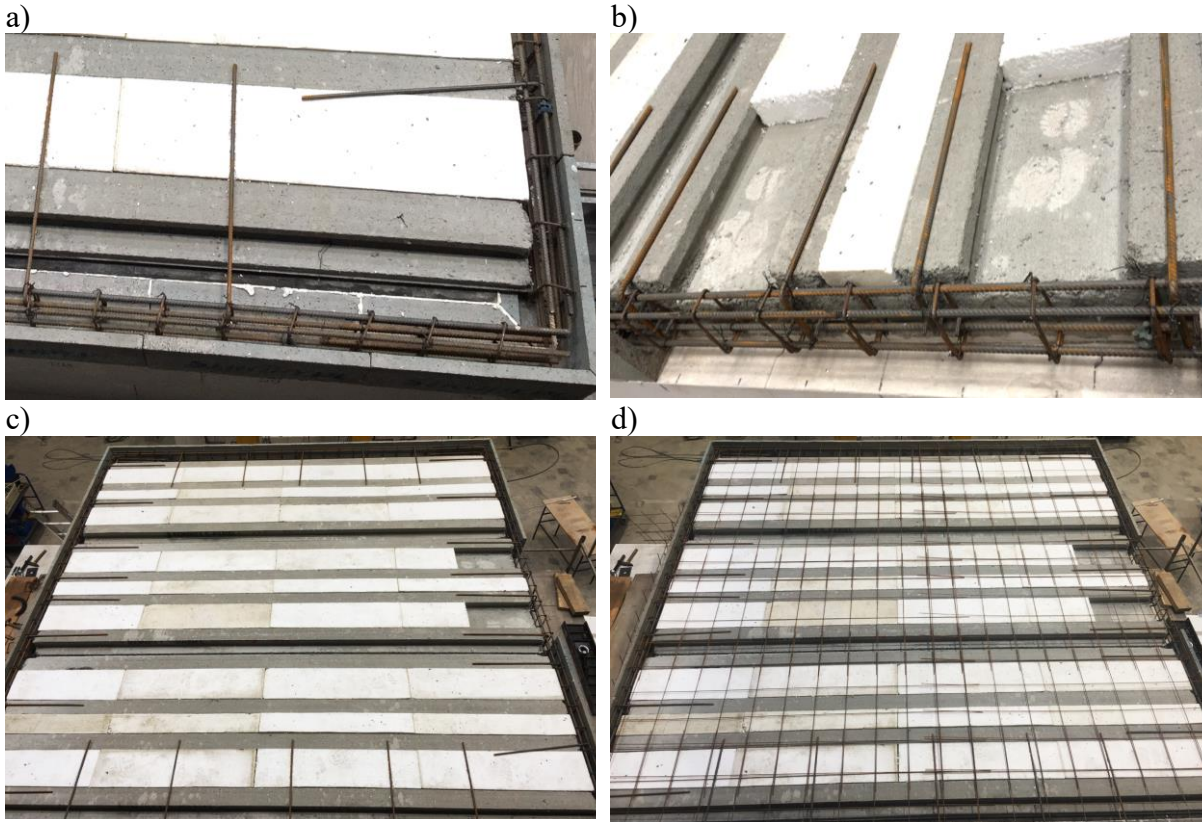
Construction details at the stage of making the slab: a) reinforcing the corner, b) removing polystyrene in the place of the planned horizontal load, c) upper reinforcement with steel hooks, d) upper reinforcement with steel mesh
